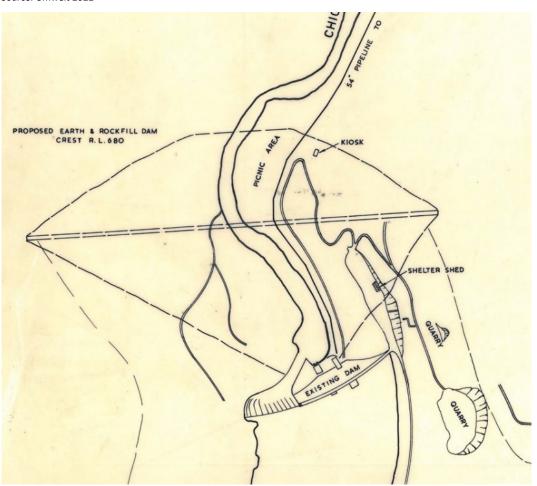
Extract from a 1967 plan of the site showing a proposed new Dam that was never built. The larger quarry is the present Depot
